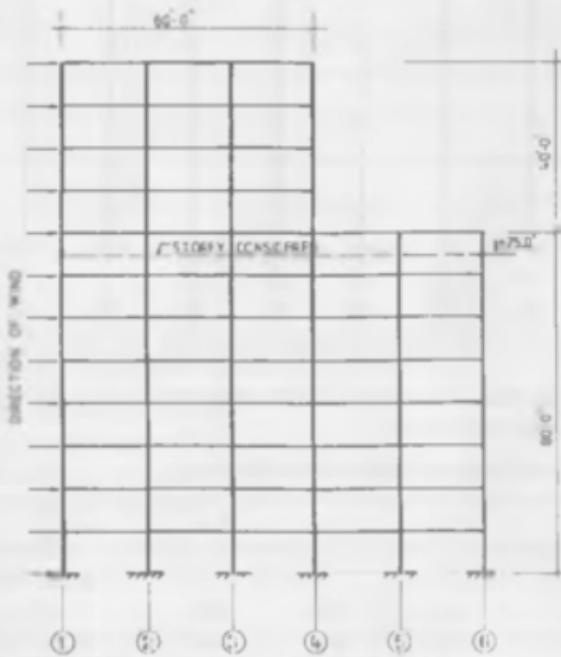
Plan and elevation of a building referred to in the illustrated example – side elevation.
